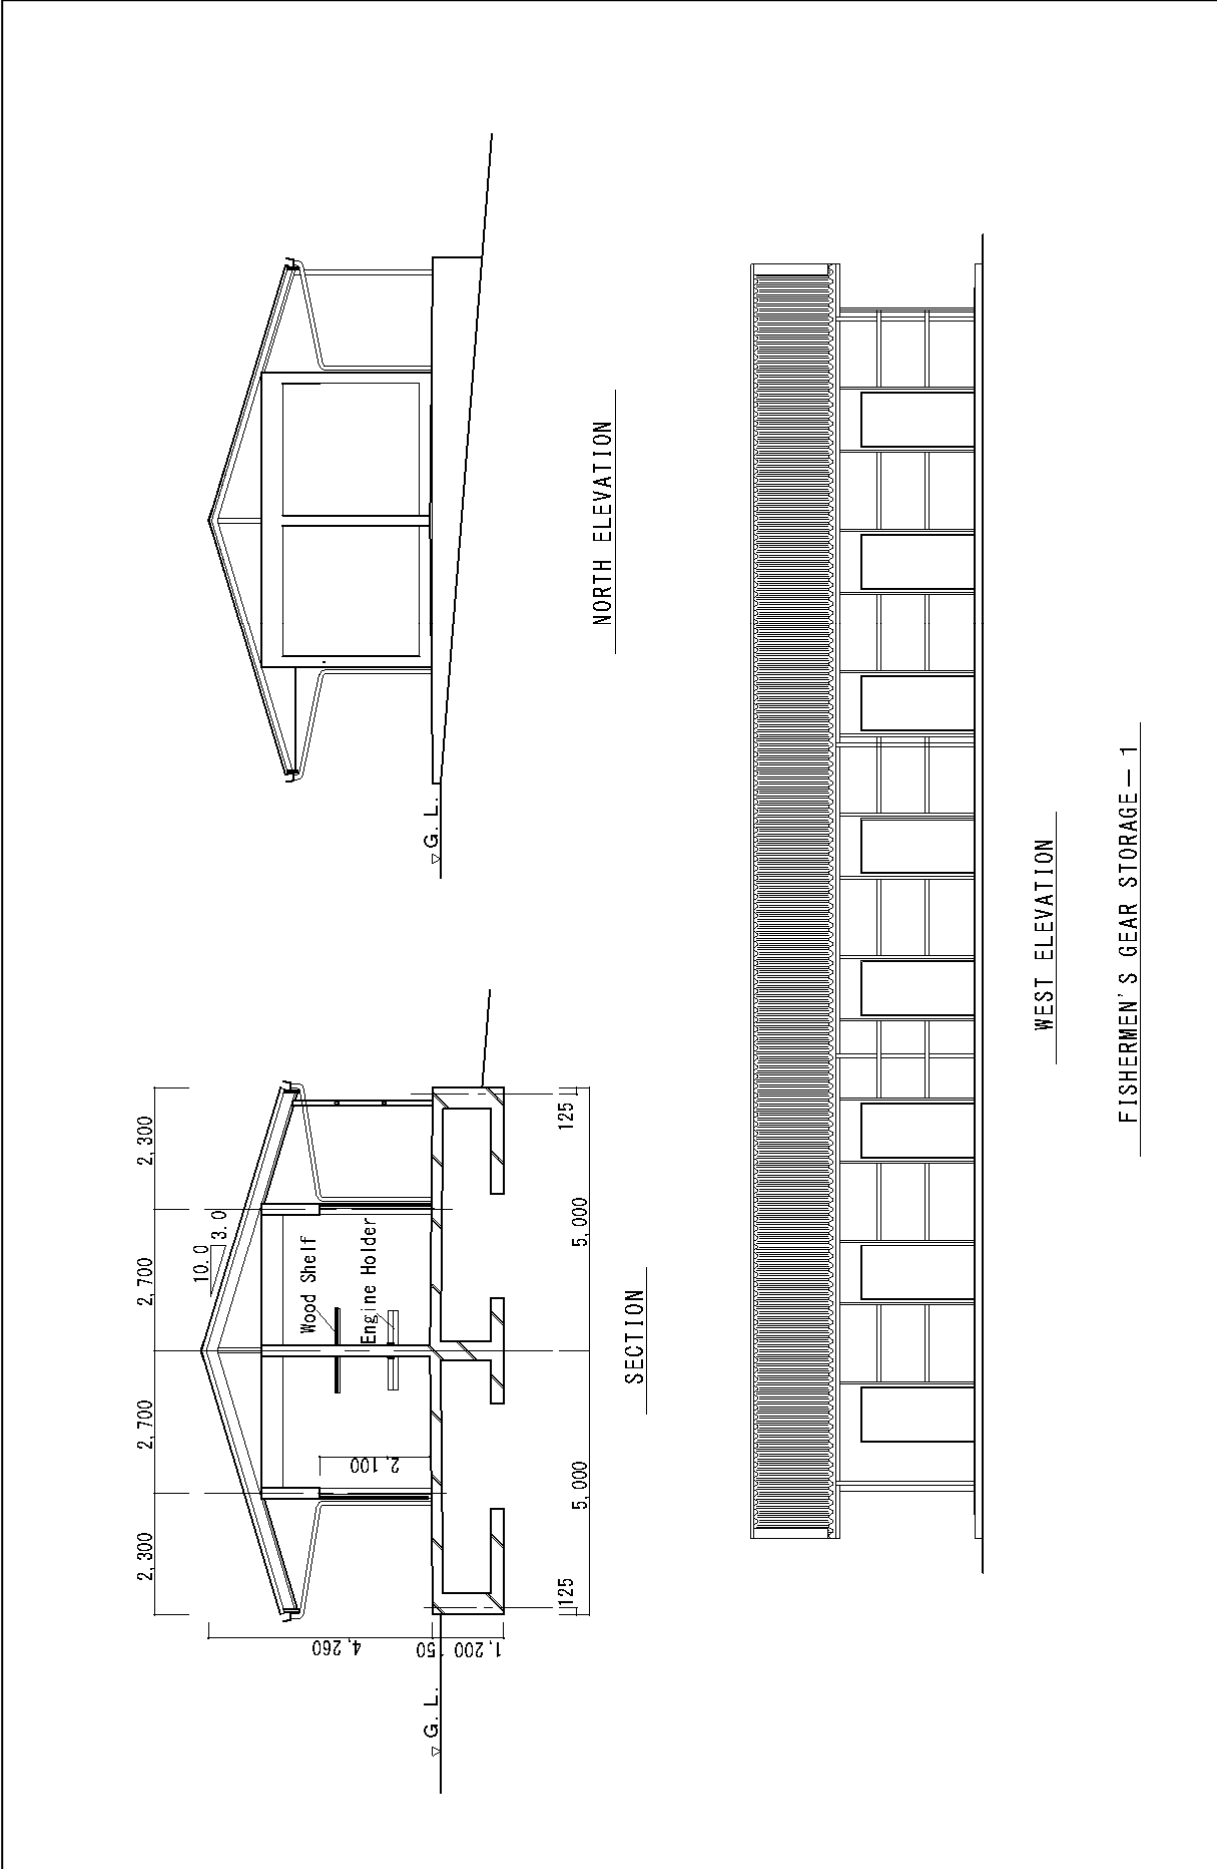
(12) Elevation & Section of Gear Lockers-1
